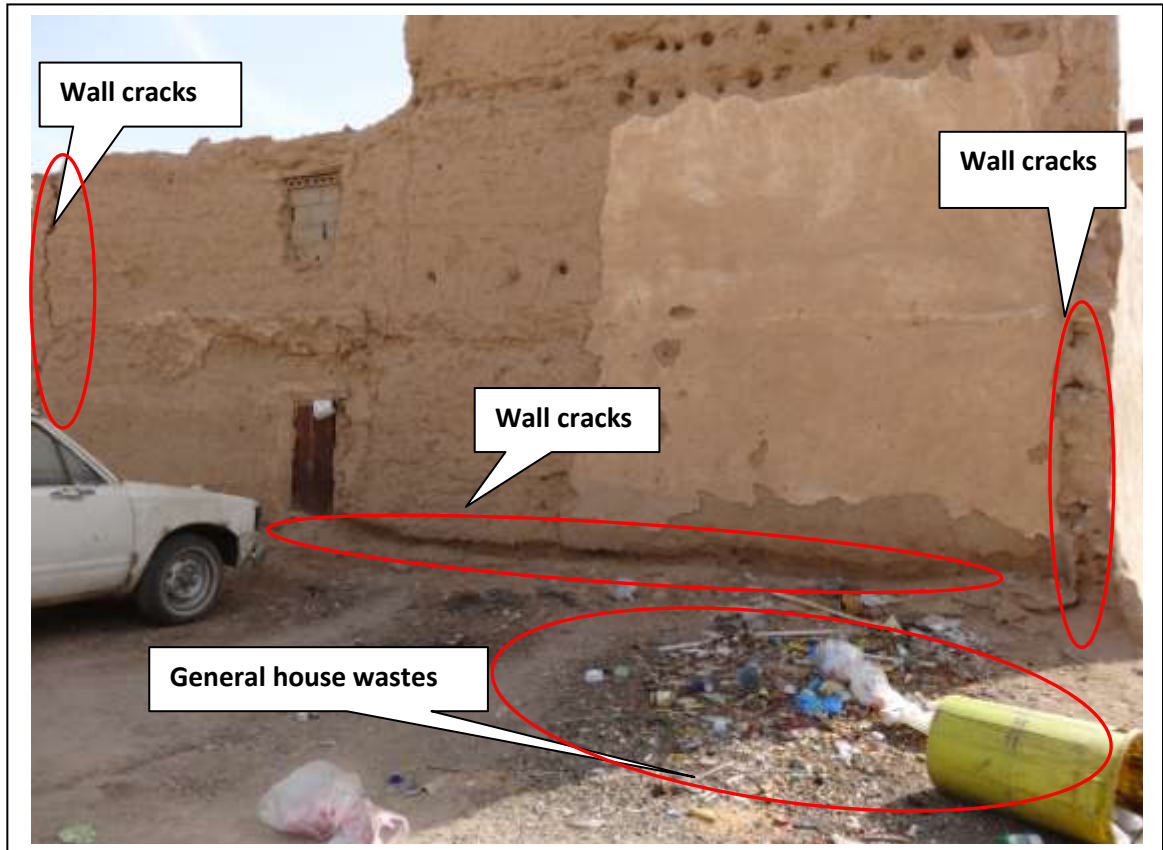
A picture taken south of Al-Dawadmi City of a mud house full of wall cracks and surrounded with general housing waste
